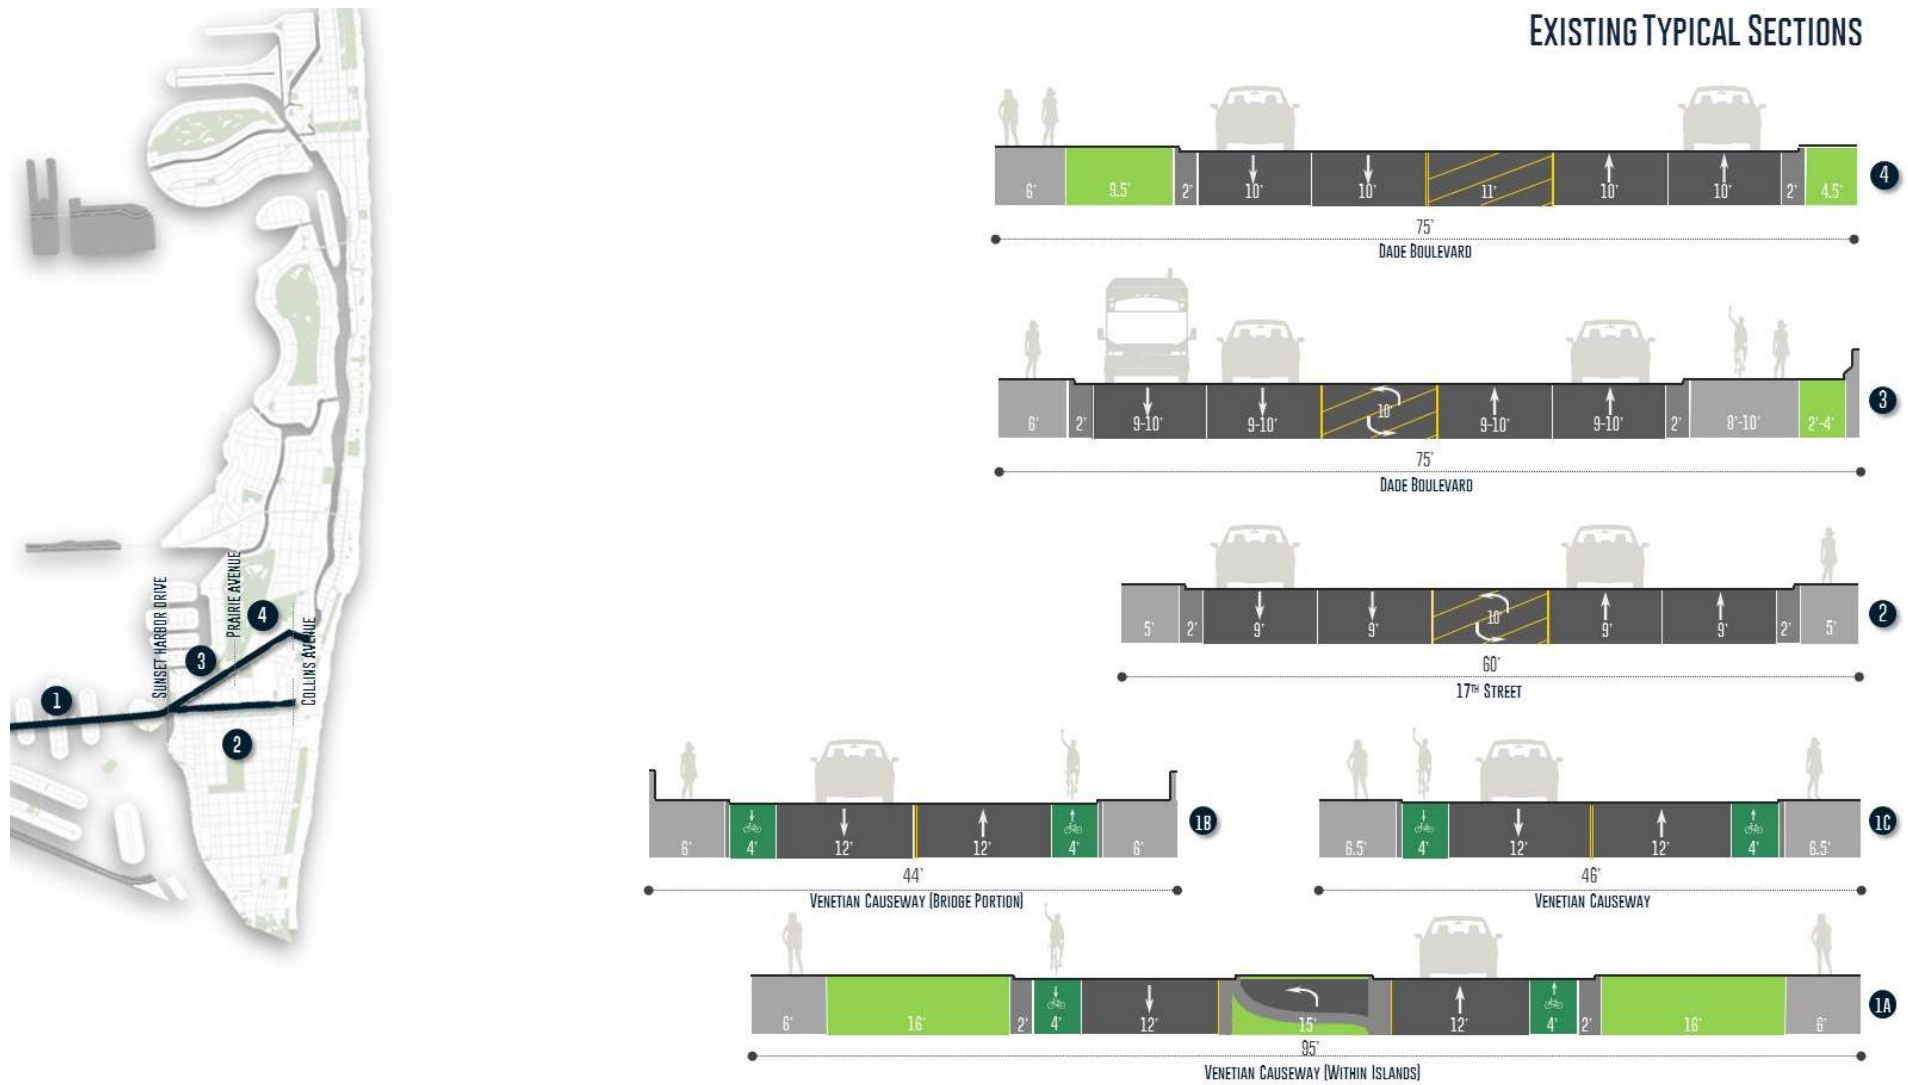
Venetian Causeway - Dade Boulevard - 17th Street Corridor Segments and Existing Typical Sections
